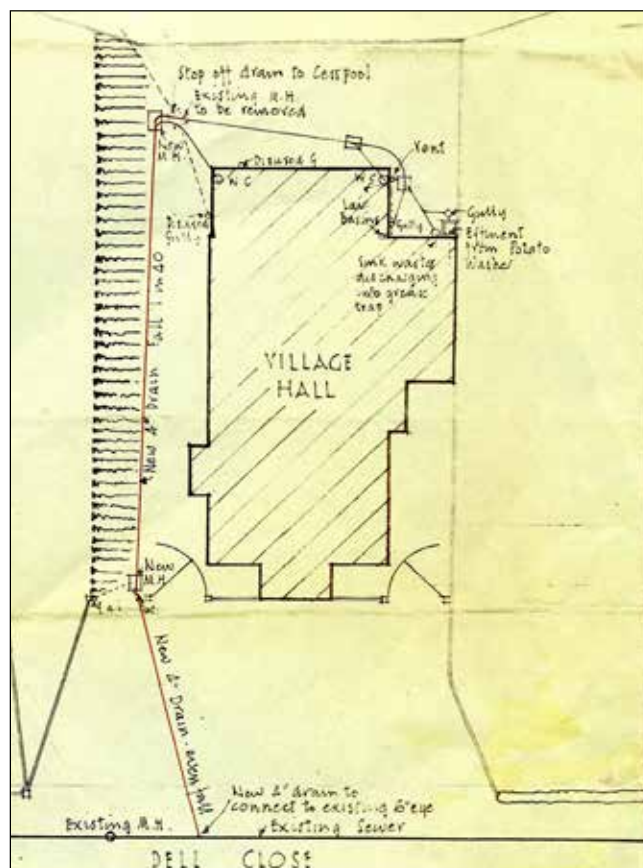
Detail from the 1935 plan of SCC kitchen
